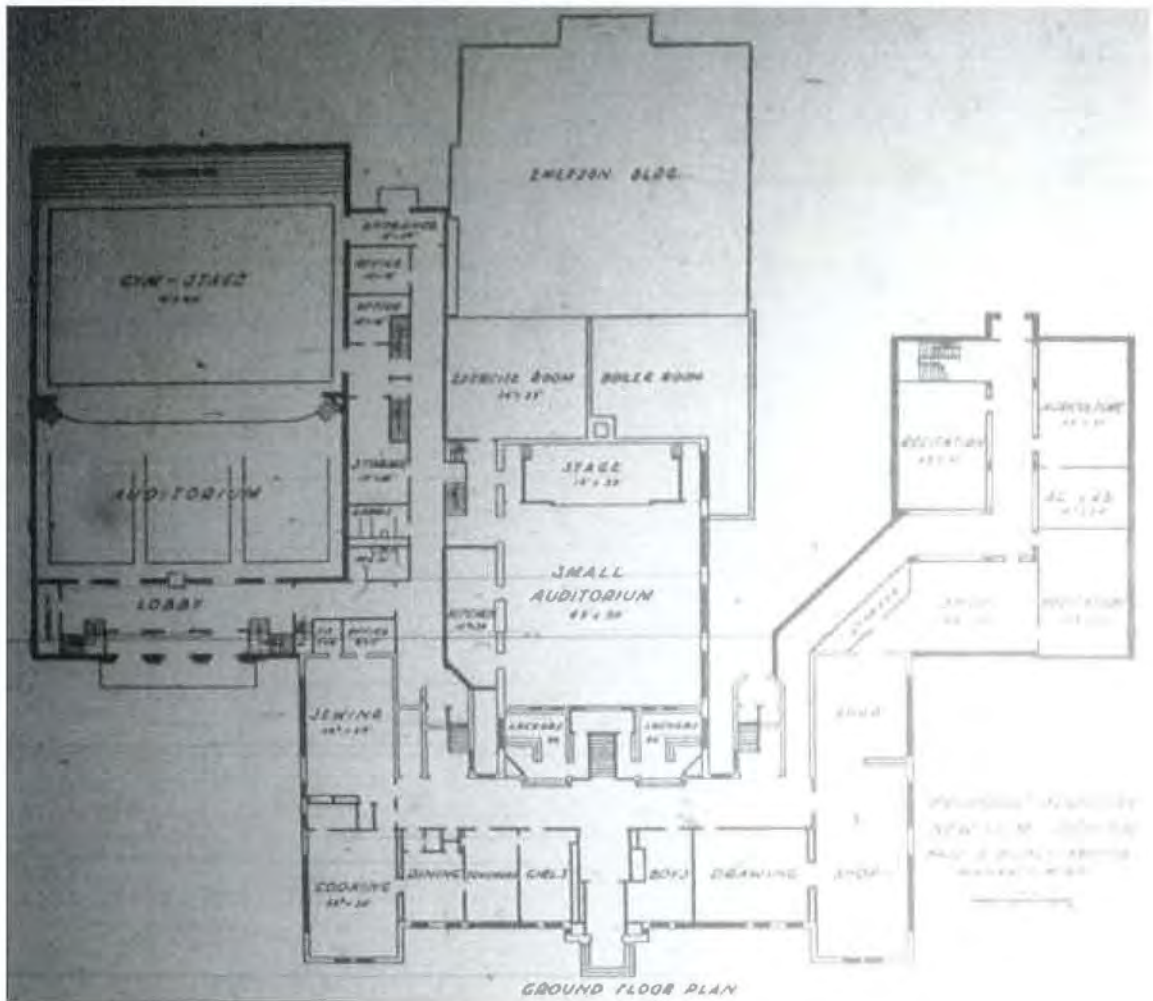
New Ulm High School, First Floor, 1939 (Ground floor in 1939 plans)
